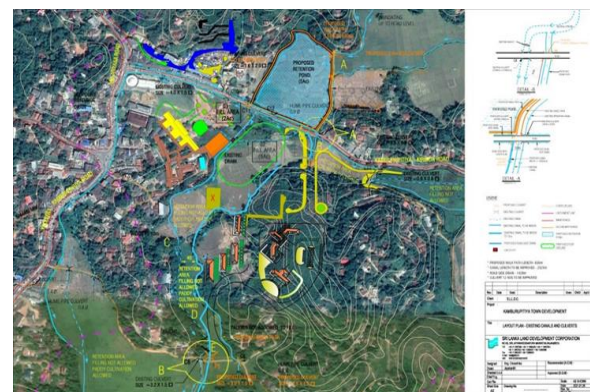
Proposed Conceptual Drainage Plan with UDA Proposal
